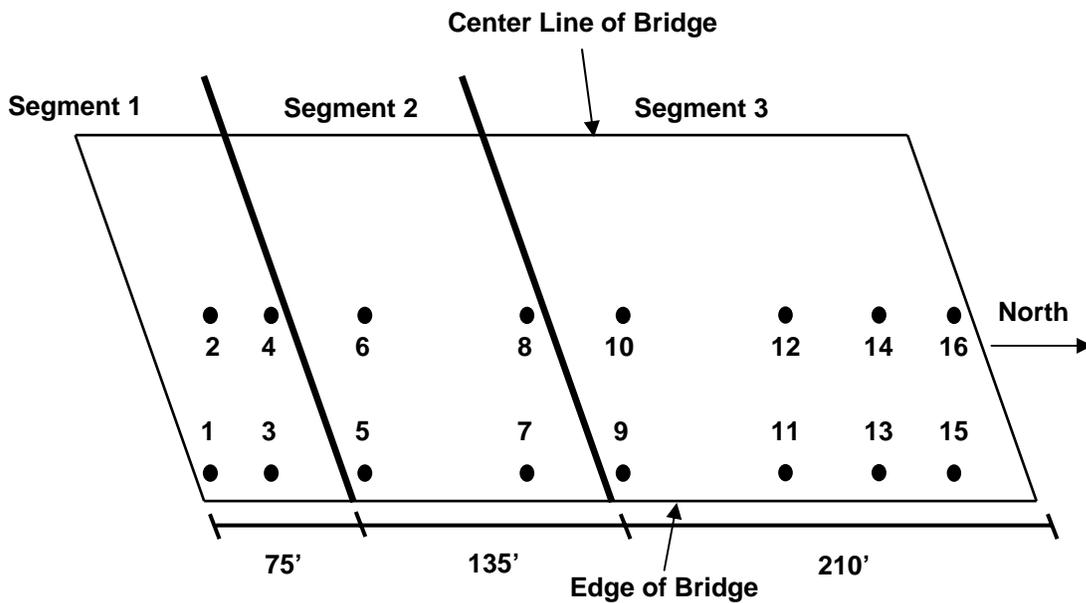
Temperature sensor layout for the I-85 Bridge
